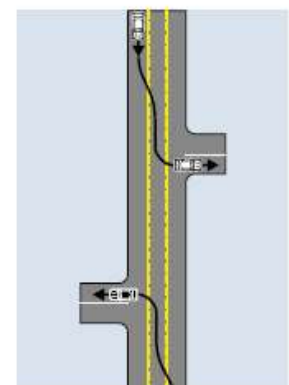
Locate Driveways on Opposite Sides of a Roadway to Achieve a Positive Offset
